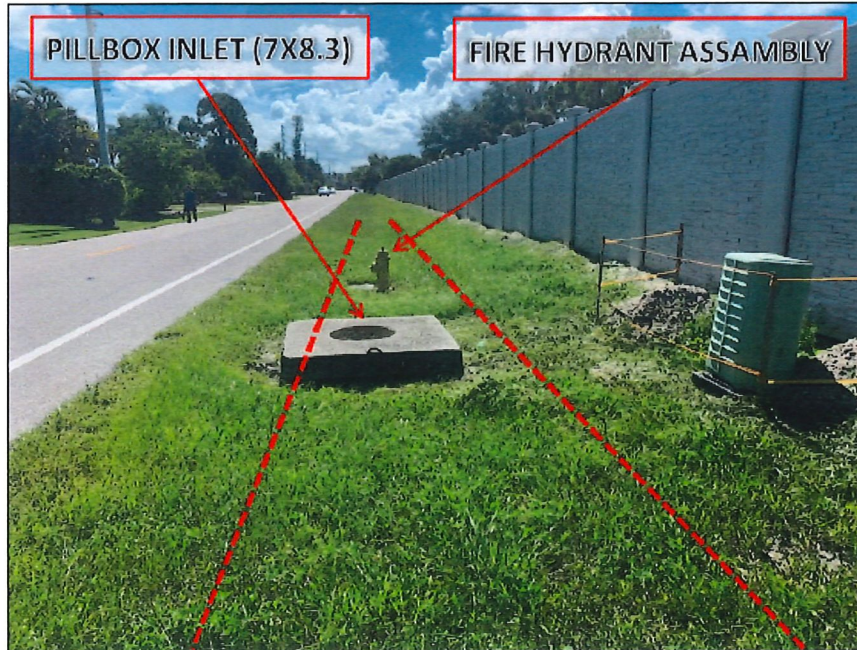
91st Avenue N and 8th Street N Sidewalk Alignment and Drainage (East)
